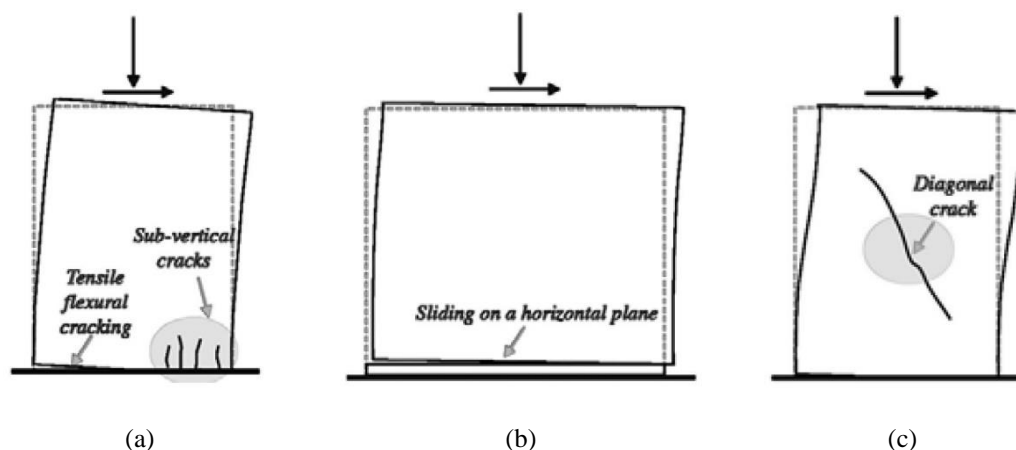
5. In-plane typical damages caused by horizontal loads; (a) rocking, (b) sliding shear and (c) diagonal cracking (NIKER, 2010).
